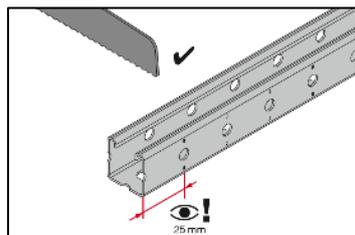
Installation instructions for Hilti MT-TFB OC thread forming bolts
